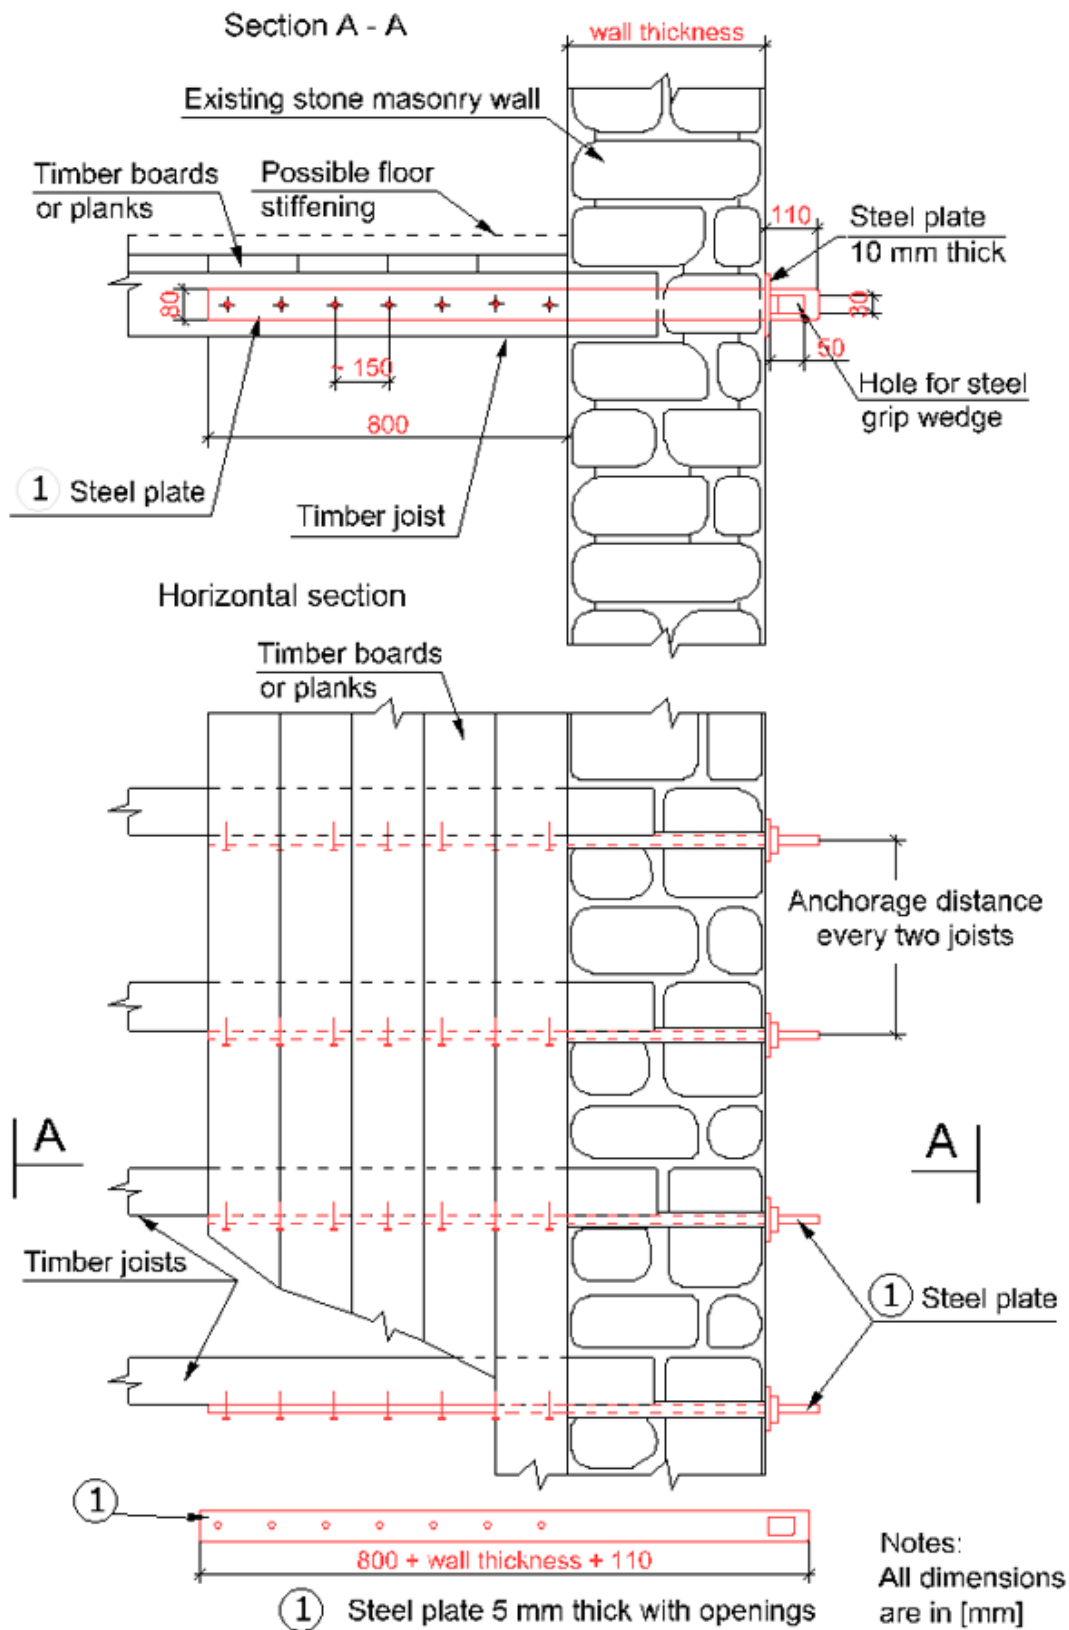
Detail for anchoring of floor joists to masonry walls [46]
